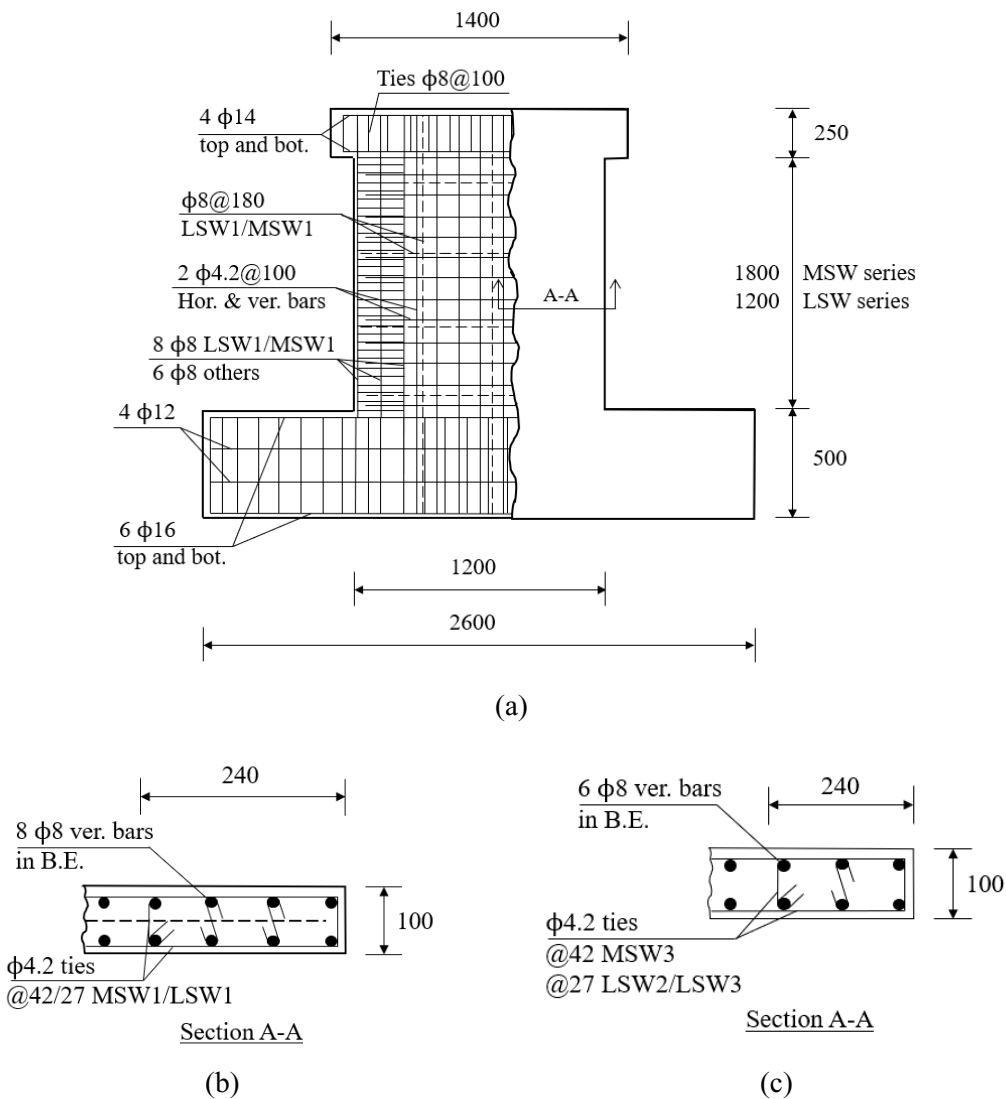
Schematic reinforcement details of the selected RC wall specimens tested by Salonikios *et al.* (1999): (a) elevation views; (b) section A-A for LSW1 and MSW1 specimens; (c) section A-A for MSW3, LSW2 and LSW3 specimens
